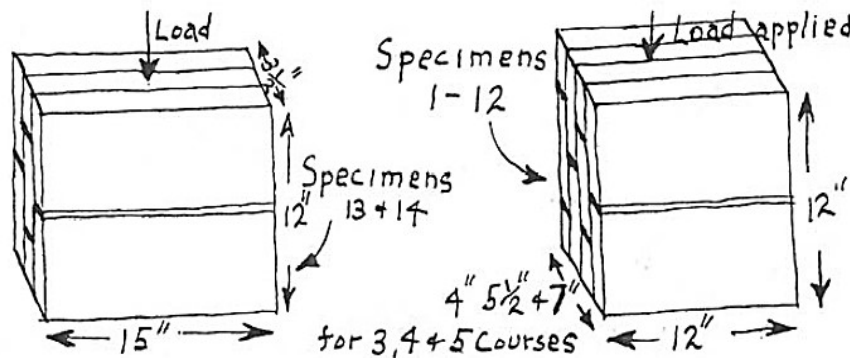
Specimens used in test carried out at MIT in 1927 (Archive Guastavino/Collins. U. Columbia).
